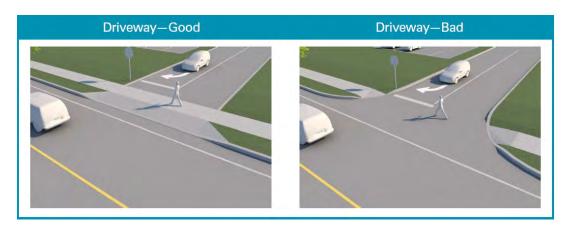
Sidewalk and Driveways (Source: CSDG)
